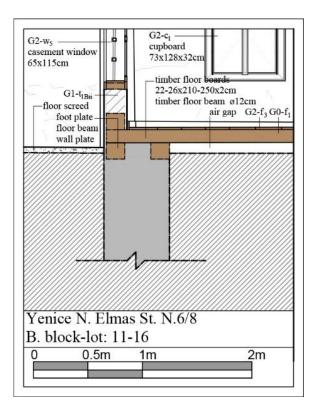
Drawing of simple flooring (Type 1) consists of timber floor beams and timber floor boards in the ground floor without basement (Yenice N. b.block-lot:11-16)
